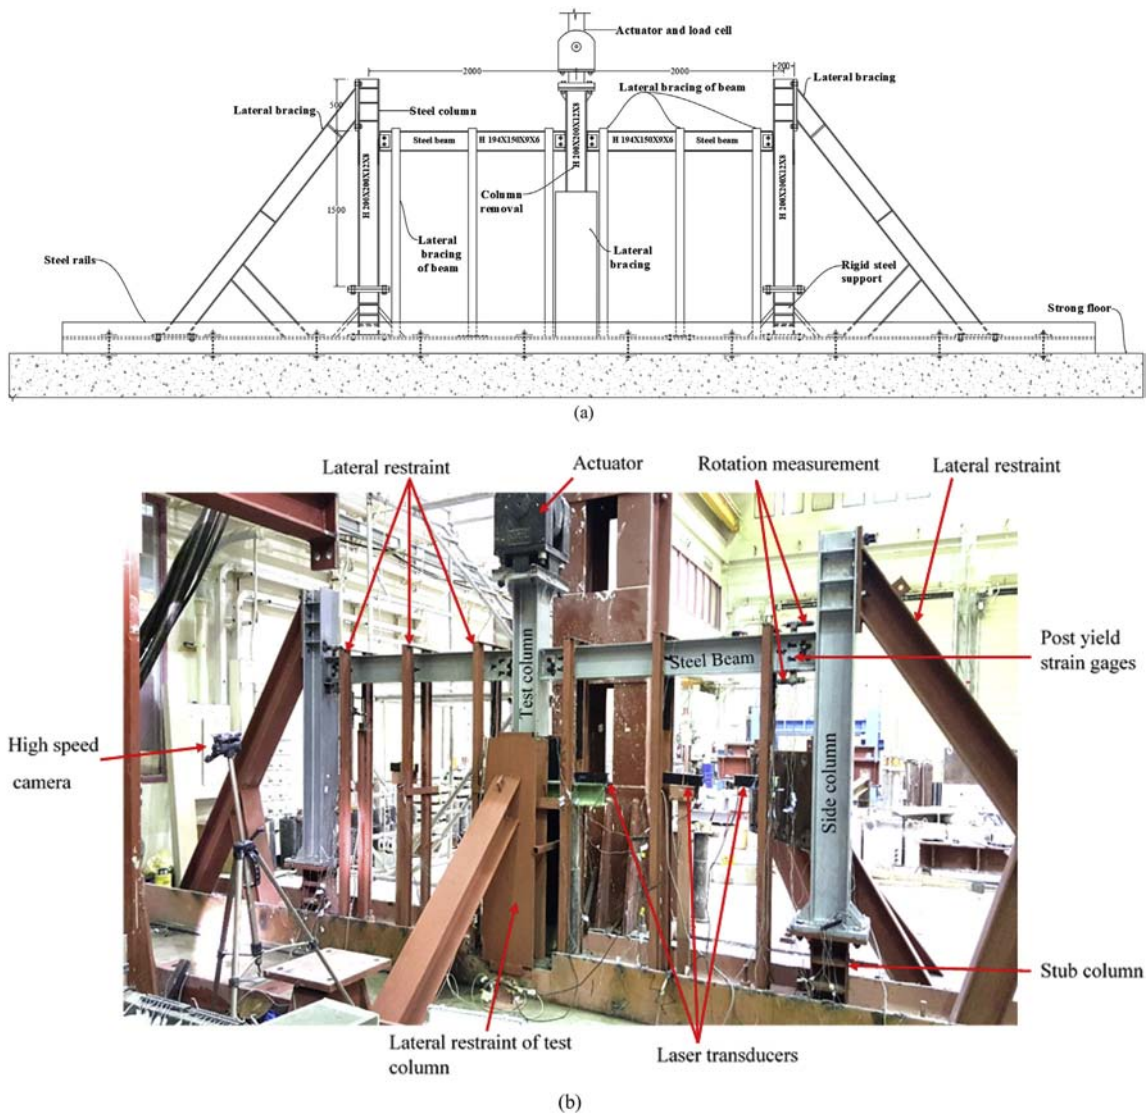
Details of 2D assembly S-P-B-2D (Note: All dimensions are measured in mm): (a) Testing setup; (b) Instrumentation layout.
